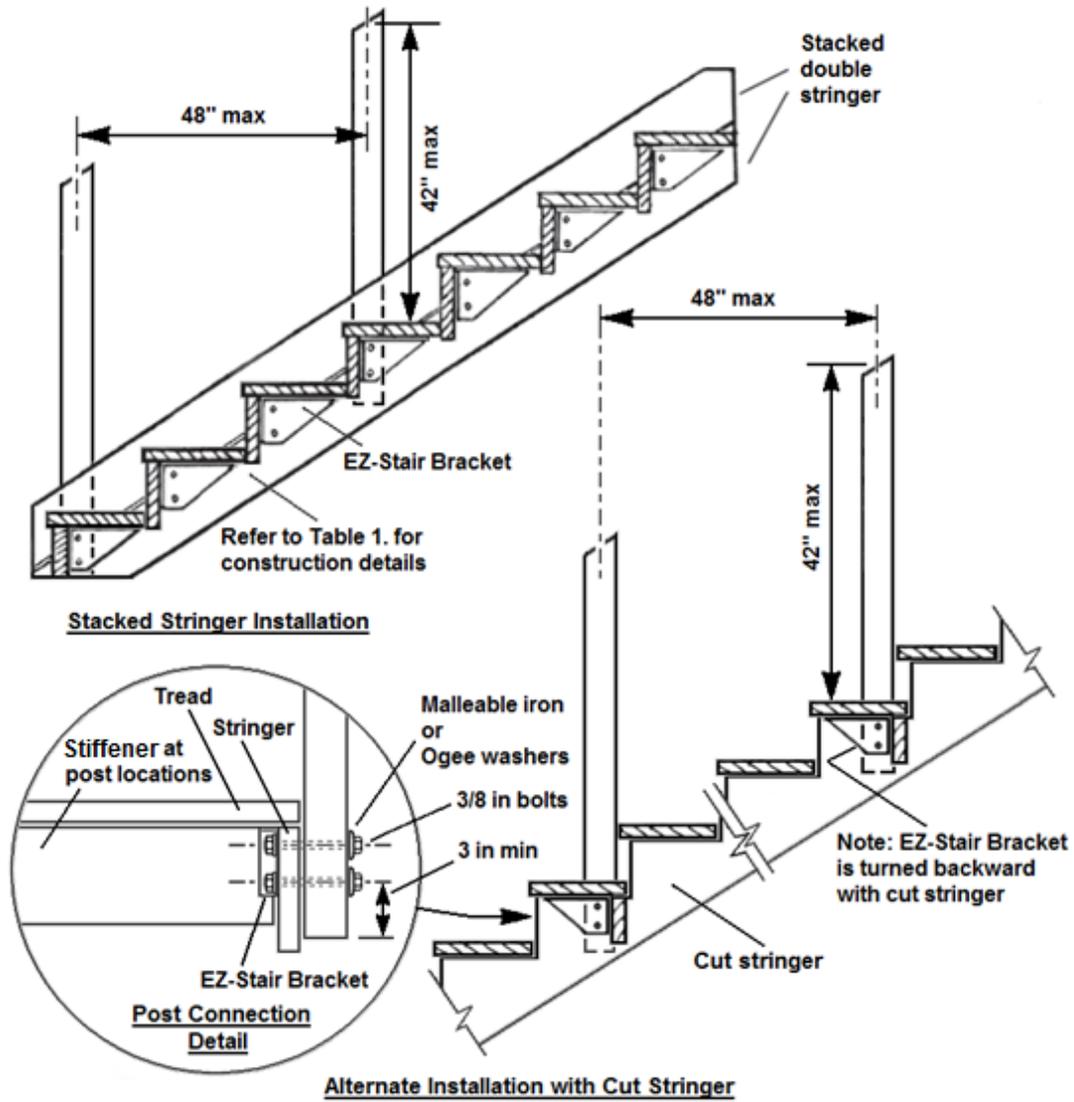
BRACKET INSTALLATION for GUARD POST CONNECTION
